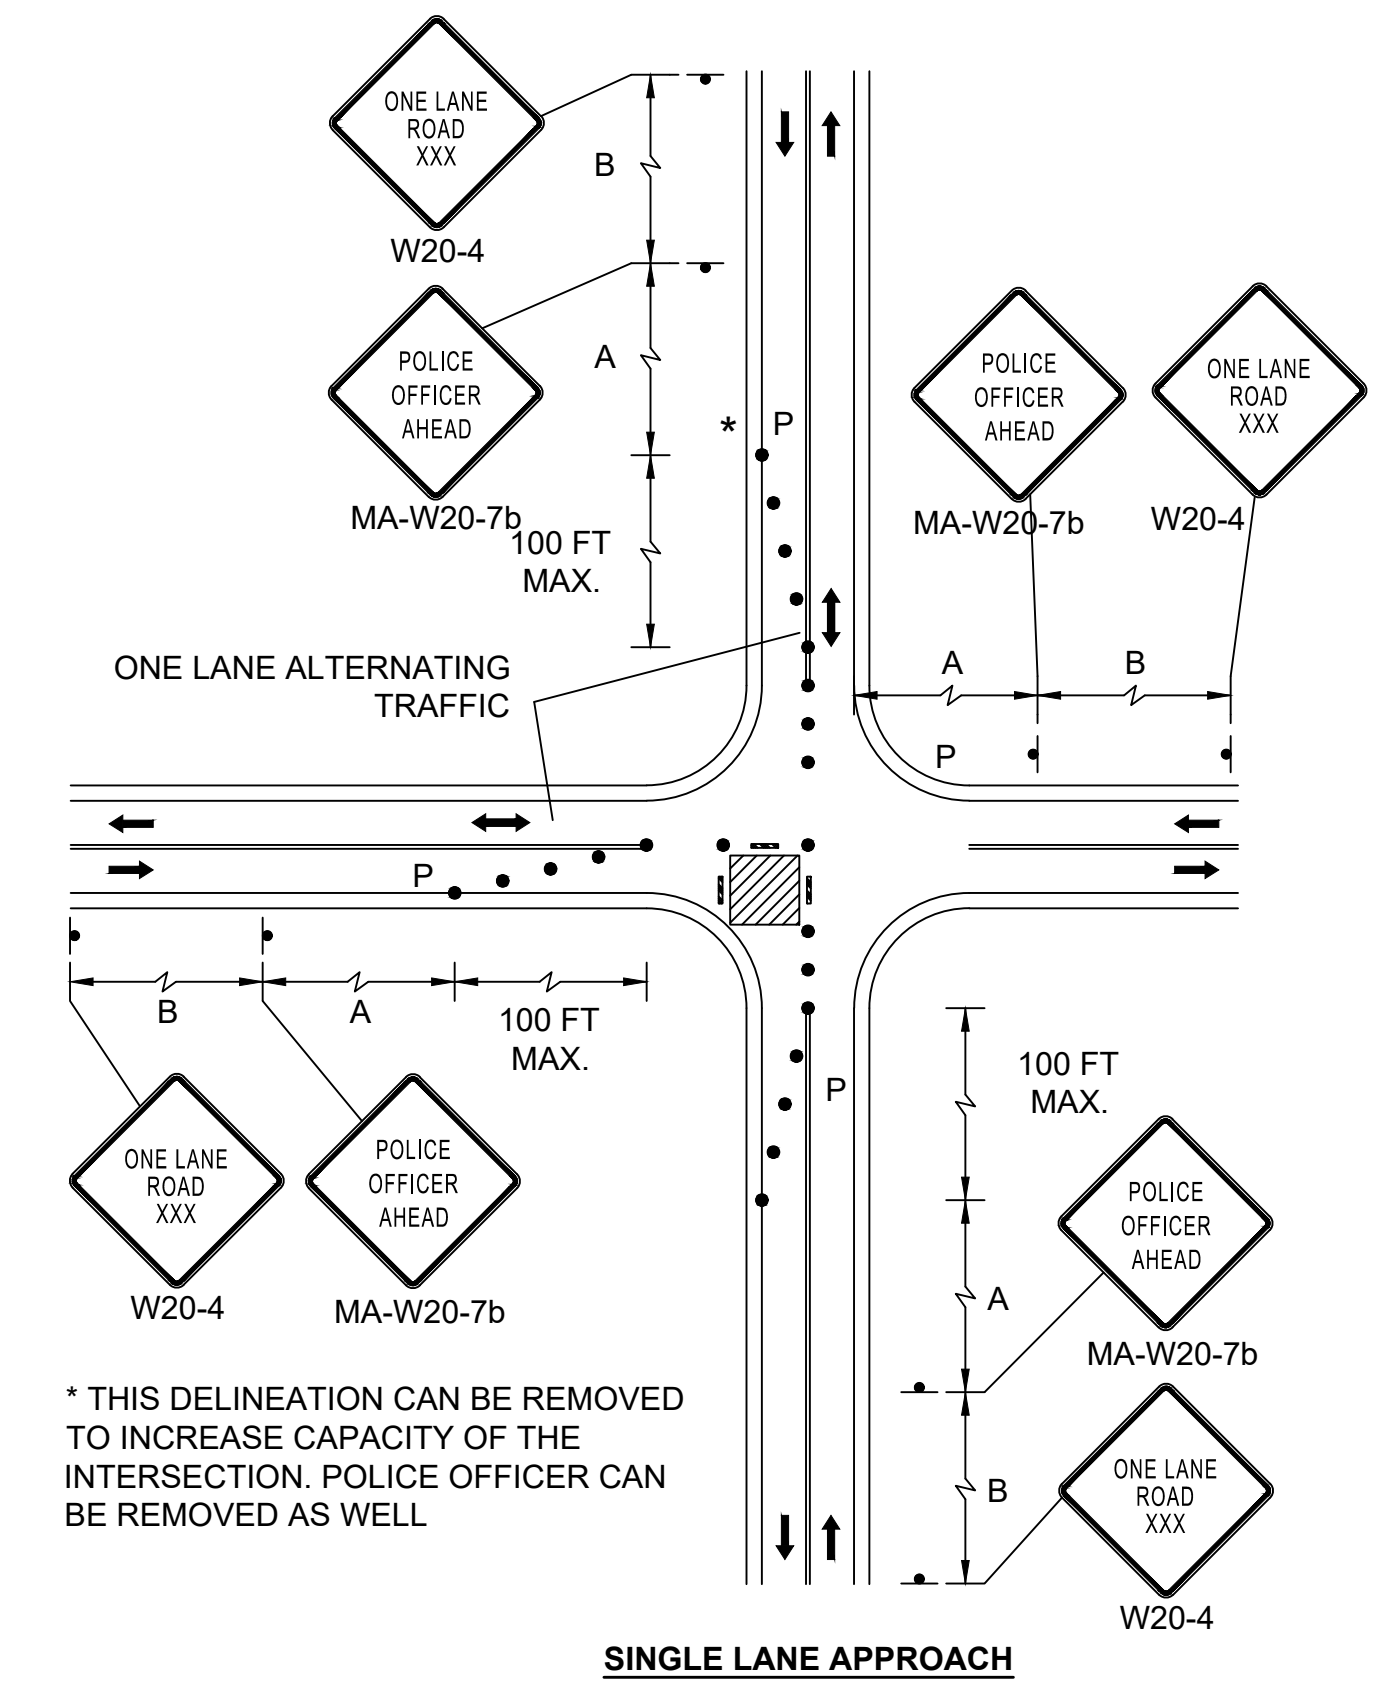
DETAIL IS TO BE USED IN CONJUNCTION WITH THE PROPOSED LANE CLOSURE DETAILS AND DURING CONSTRUCTION STAGING, AS DIRECTED BY THE ENGINEER. ADJUSTMENTS TO SIGNING AND DELINEATION MAY BE REQUIRED.
